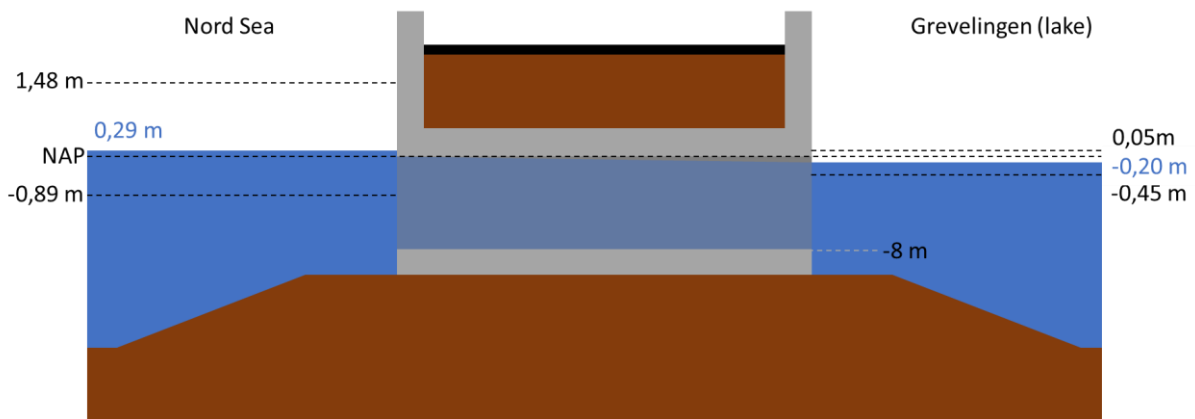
Diagrammatic drawing of the sluice caisson construction indicating the main heights
